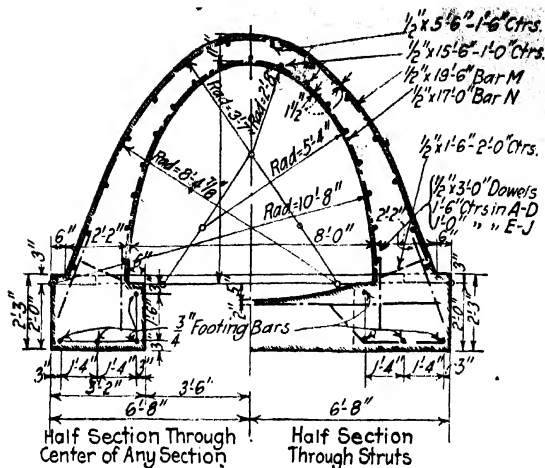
Details of a standard arch culvert of the C. M. & St. P. Ry.
